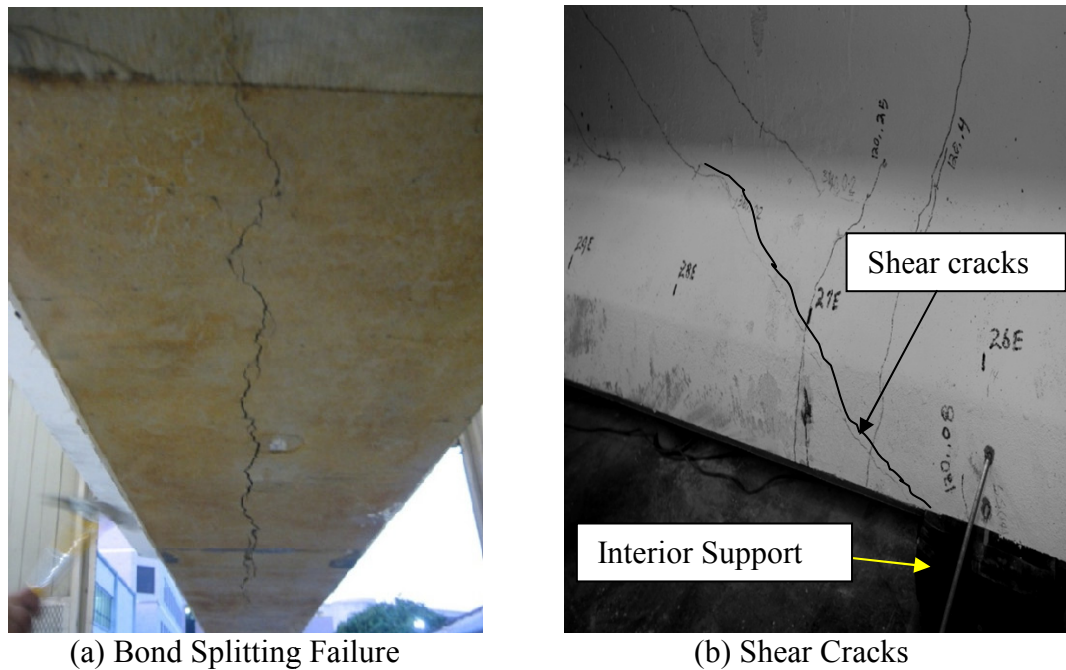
Bond Splitting Failure and Shear Cracks.
